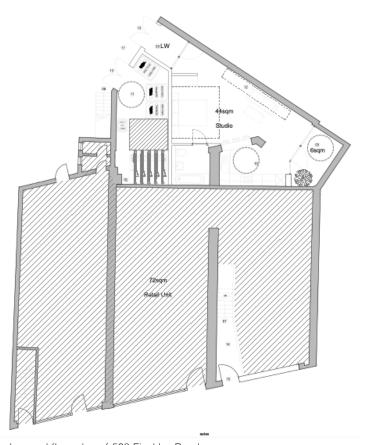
Proposed ground floor plan of 529 Finchley Road.
